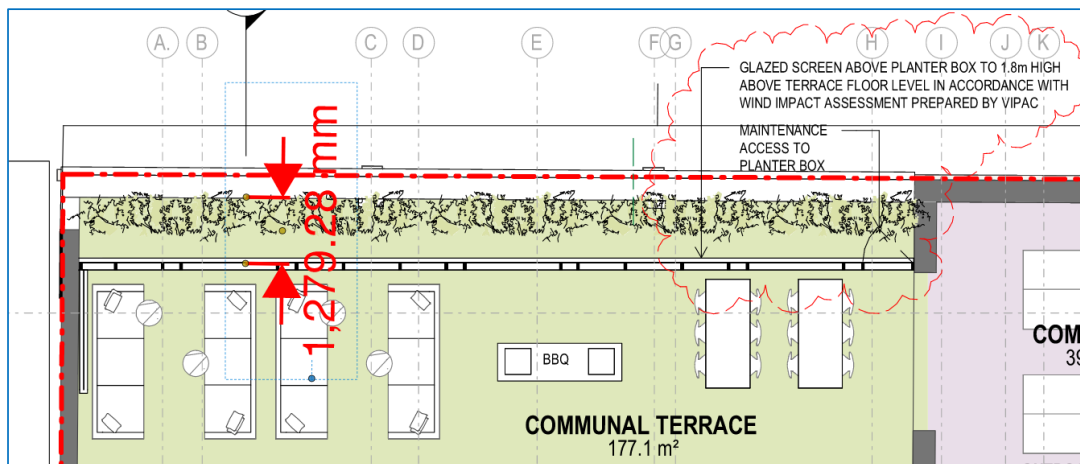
Excerpt of level 5 floor plan (at north building edge) of the proposal noting setback of glass balustrade behind parapet (Source: Hayball – revision 2, dated May 2025). Dimensioned setback by officer.
